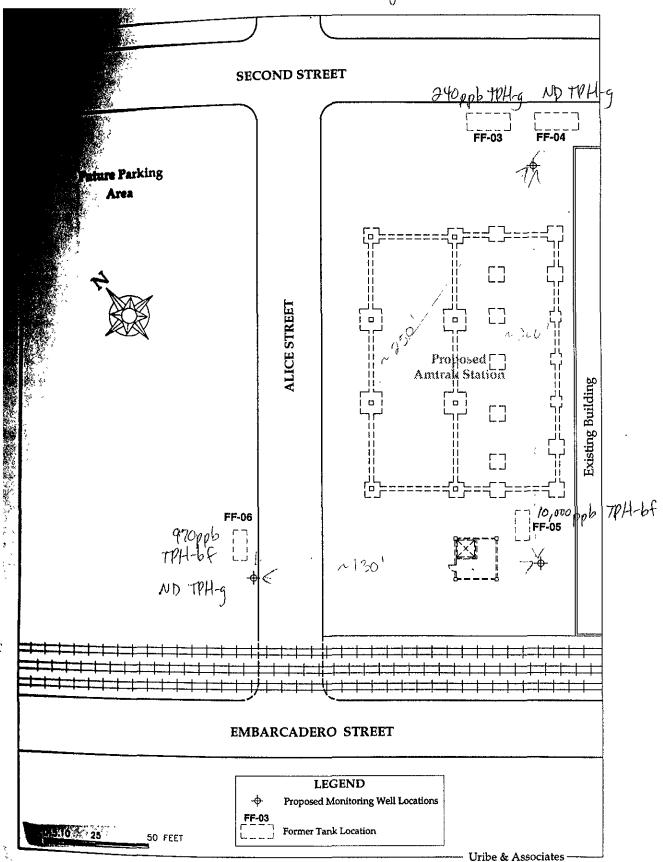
Site Plan, with Proposed Groundwater Monitoring Well Locations
